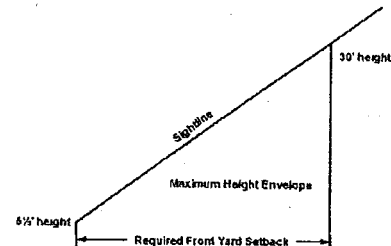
Maximum Building Height Envelope for Front Yard Setback Variance.
